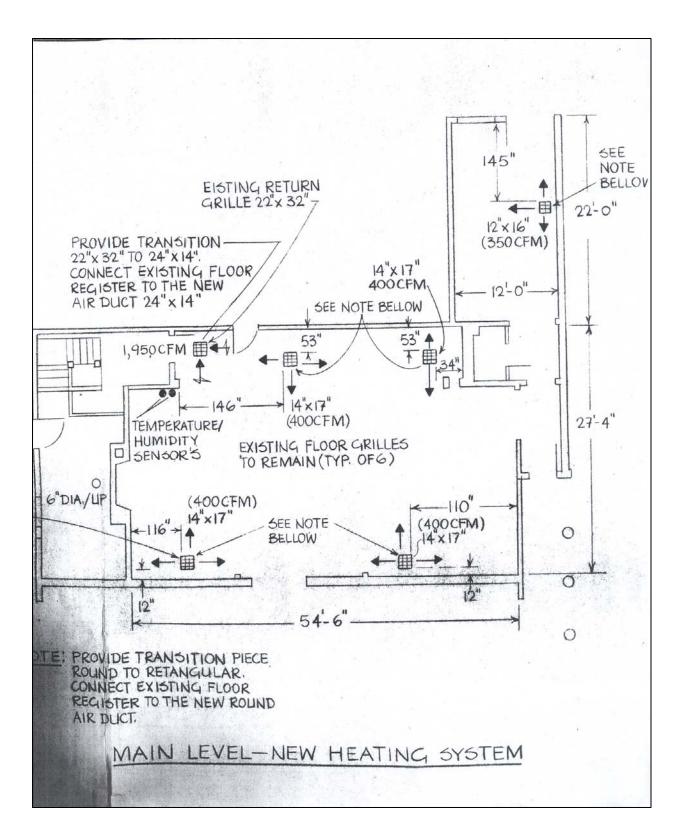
Little Studio, installation of new heating system: main level plan, 1995.
